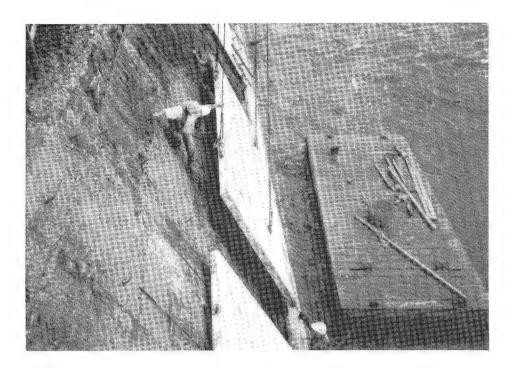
River wall panel installation, Troy Lock (from Miles 1993)
